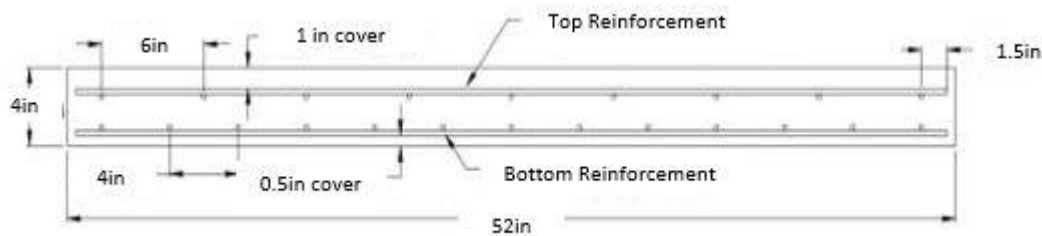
Half-scale two-way slab specimen details (Petrrou et al., 2008).
